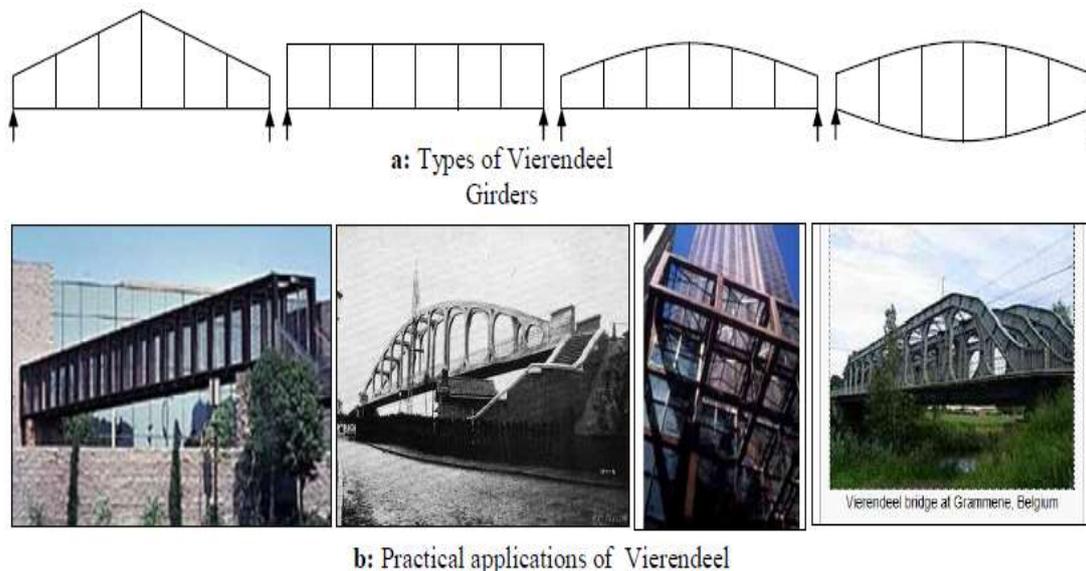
(a, b) Different Types of Vierendeel Truss and its application
